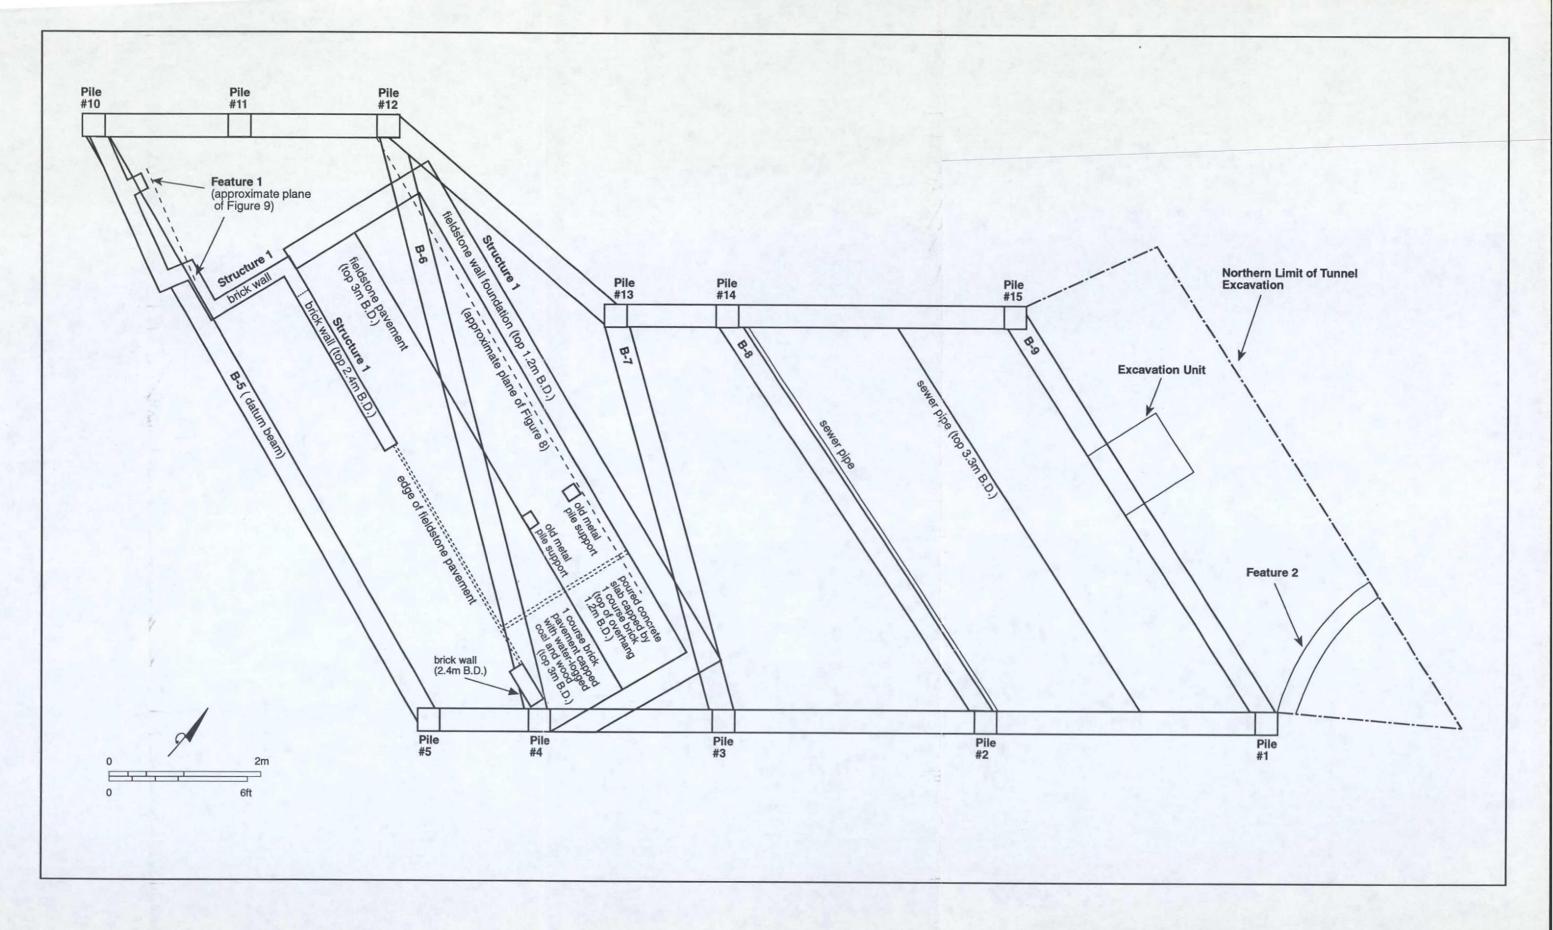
Detailed plan of tunnel showing piles 1-5 (east side) and 9-15 (west side), for decking. After Slattery Associates Inc. FS-06, Excavation Support System Decking Plan - Stage 2.
